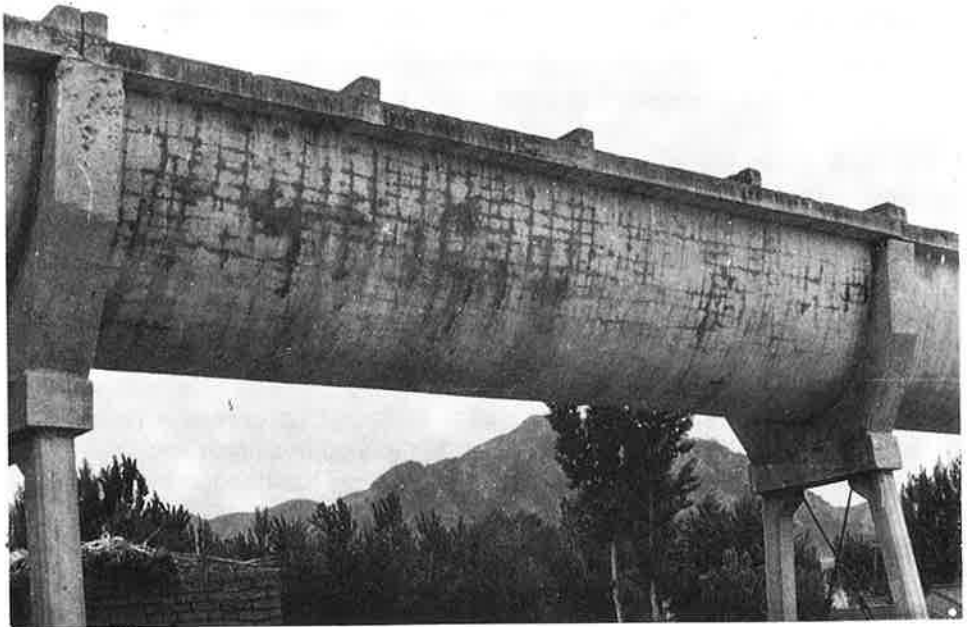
HaiZhi Aqueduct Bridge Being Full of Cracks and Peeling off.
